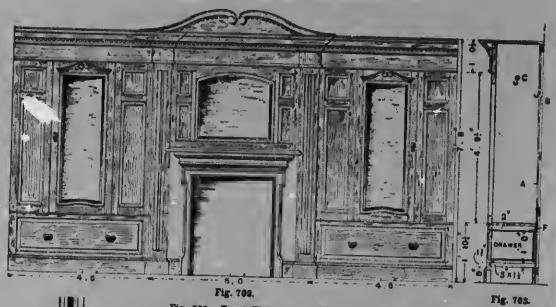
Front Elevation, of Wardrobe and Mantel Fixtures. Fig. 703.—Vertical Section through Wardrobe.
